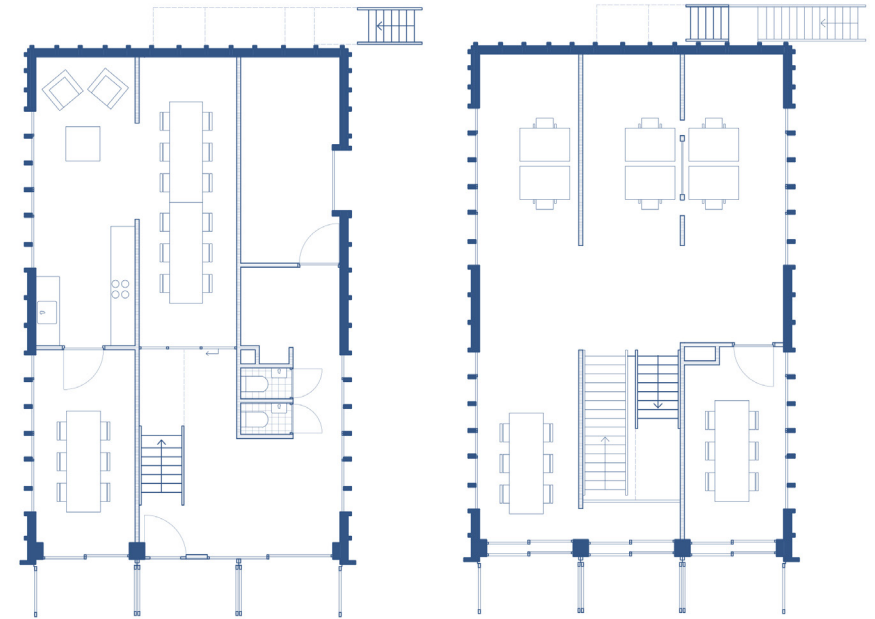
Ground Floor (Left) and First Floor (Right) of PIT Lab
